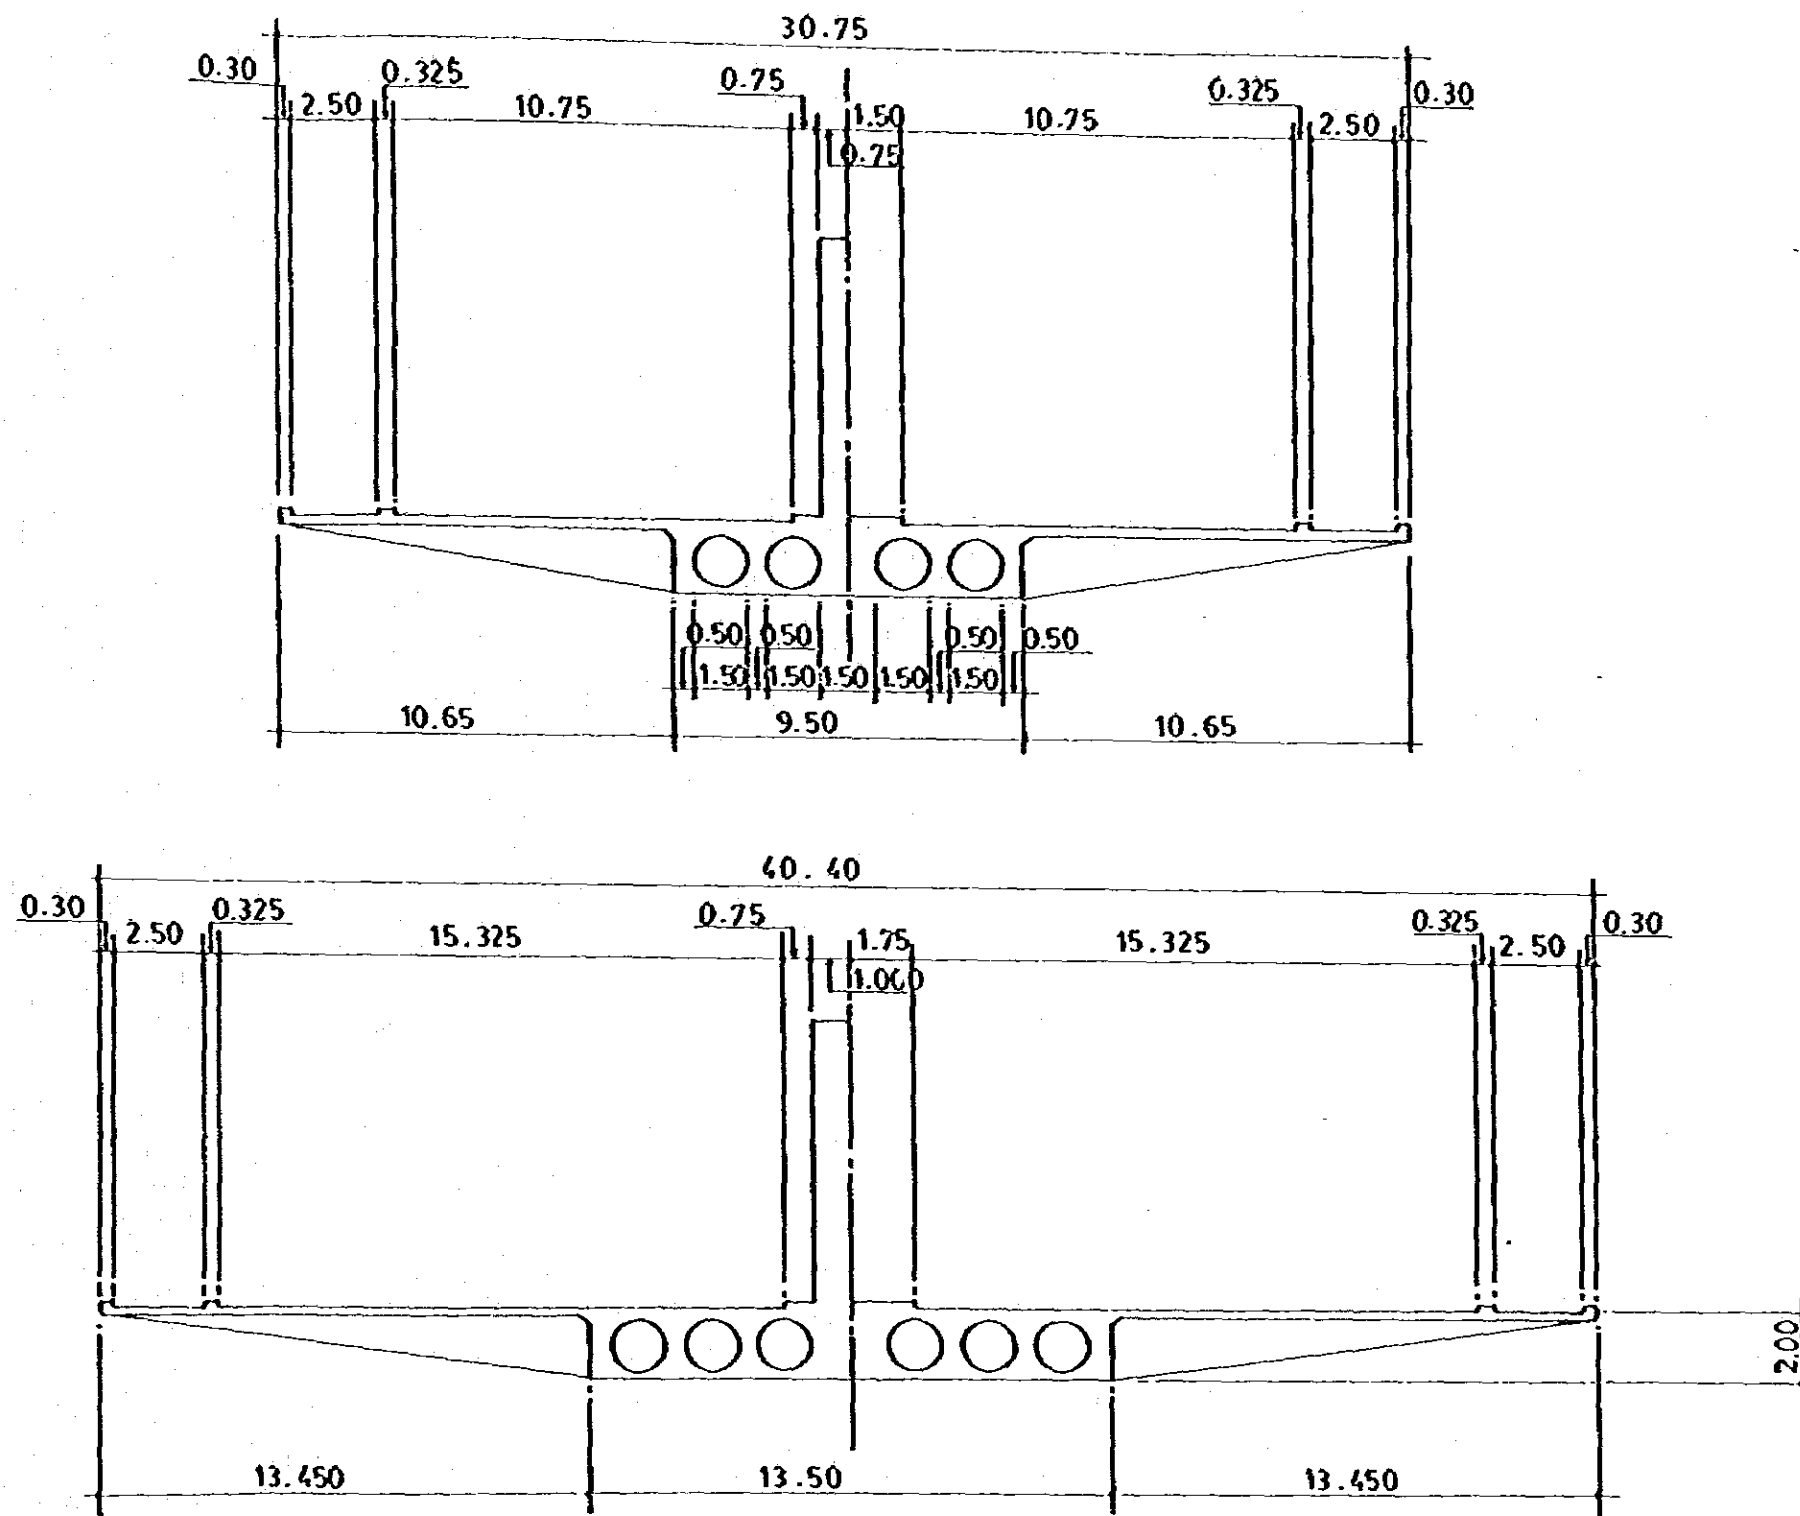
CROSS SECTION OF CONCRETE SAIL BRIDGE
